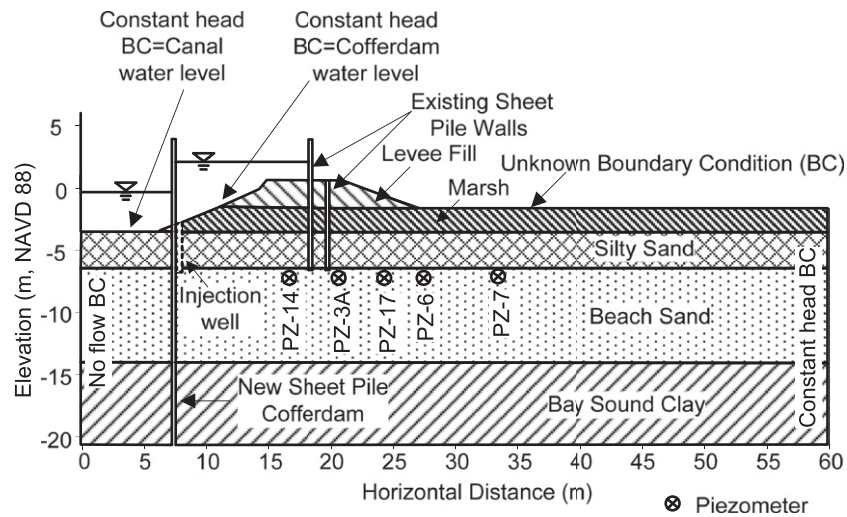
Cross section of the I-wall system indicating soil layers and location of sheet pile walls including cofferdam
